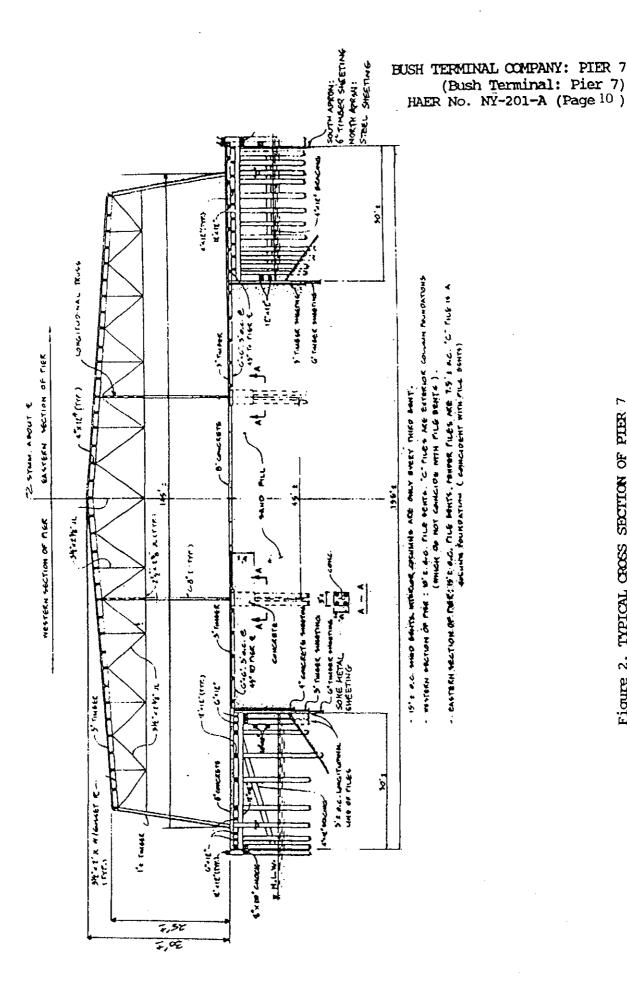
TYPICAL CROSS SECTION OF PIER 7 source: Dravo Van Houten 1984
